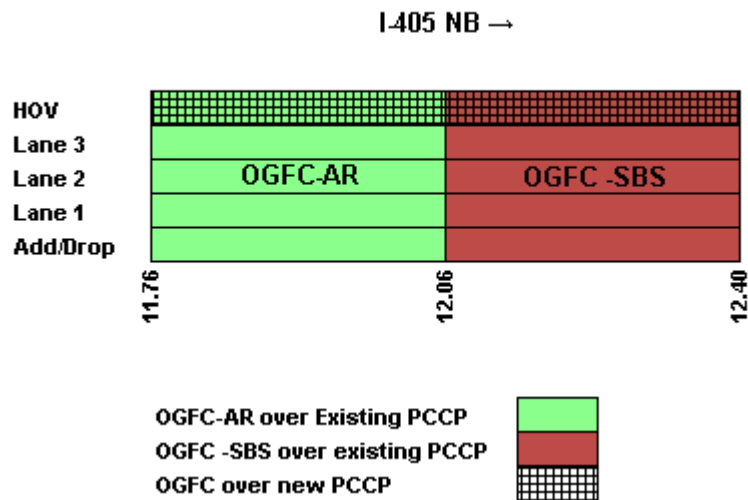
Schematic of paving limits for test sections north of I-90 (north section).
